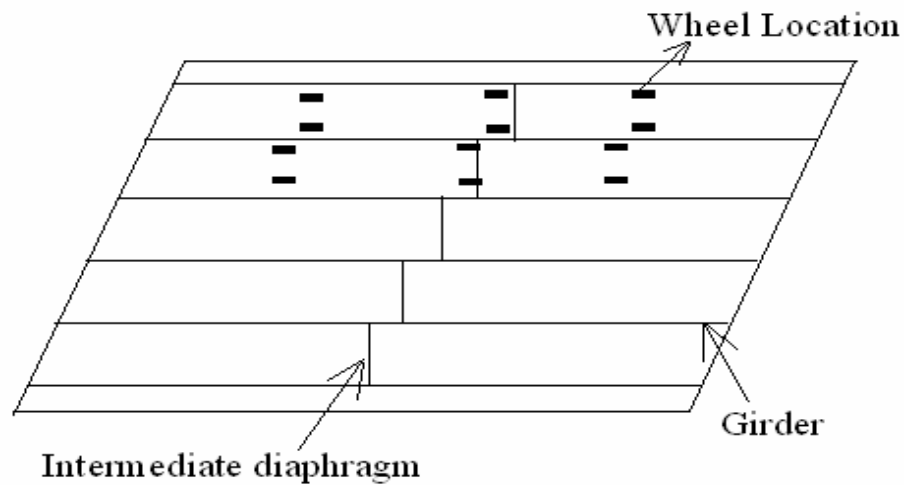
Loading configuration for obtaining maximum straining action for exterior girder in right bridge
